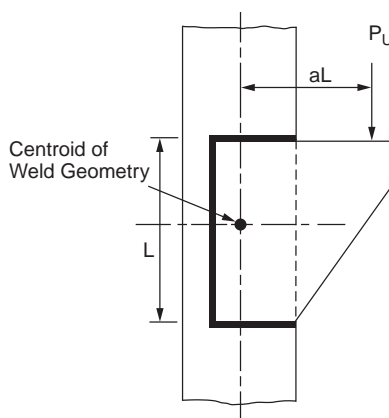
An eccentrically loaded welded bracket connection.
